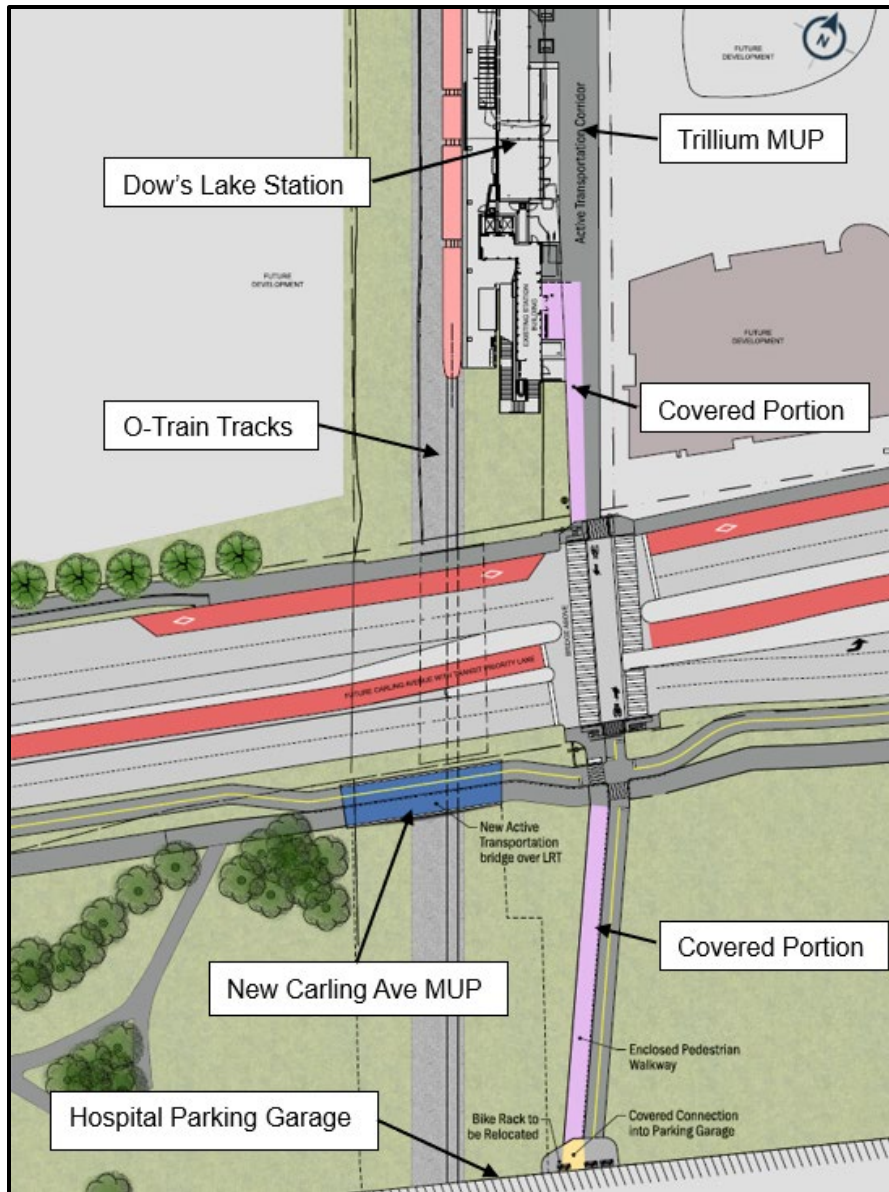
Weather-Protected Walkway and New Carling Avenue MUP
